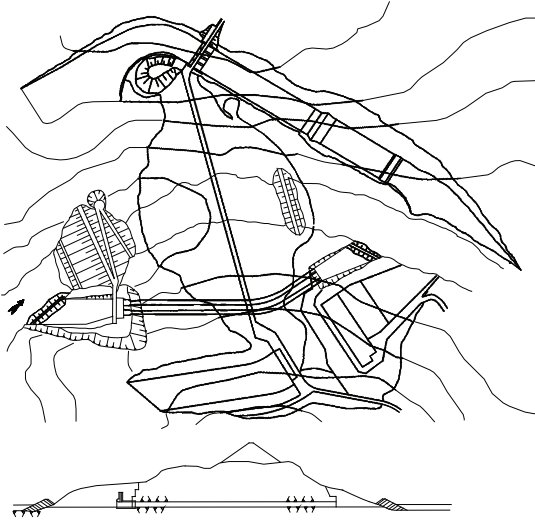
River diversion through tunnels in an abutment – plan and cross section.
